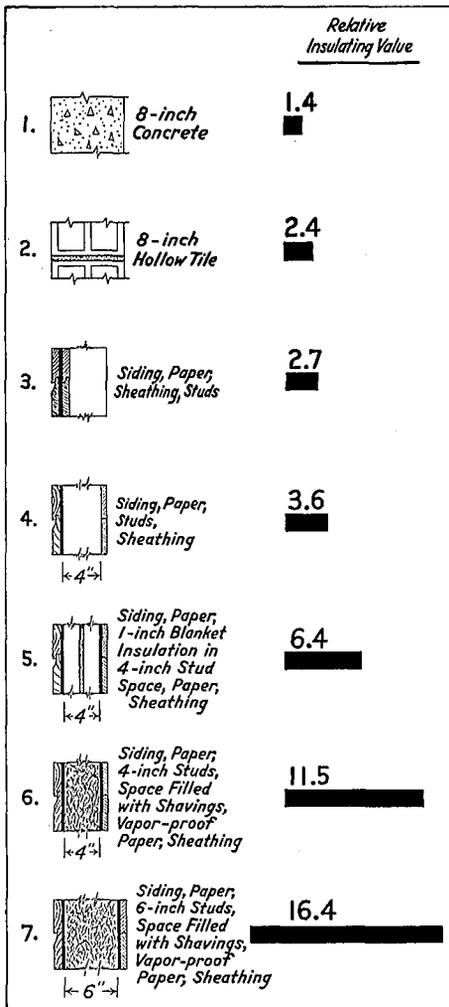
Types of wall construction, showing advantages of wall insulation.
